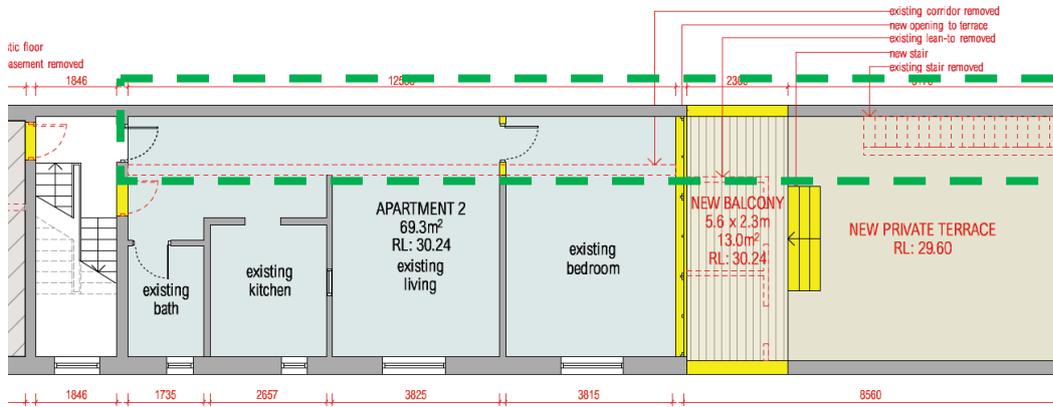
illustrating the removal of the existing common corridor that provides access to waste storage for all three residential units.
